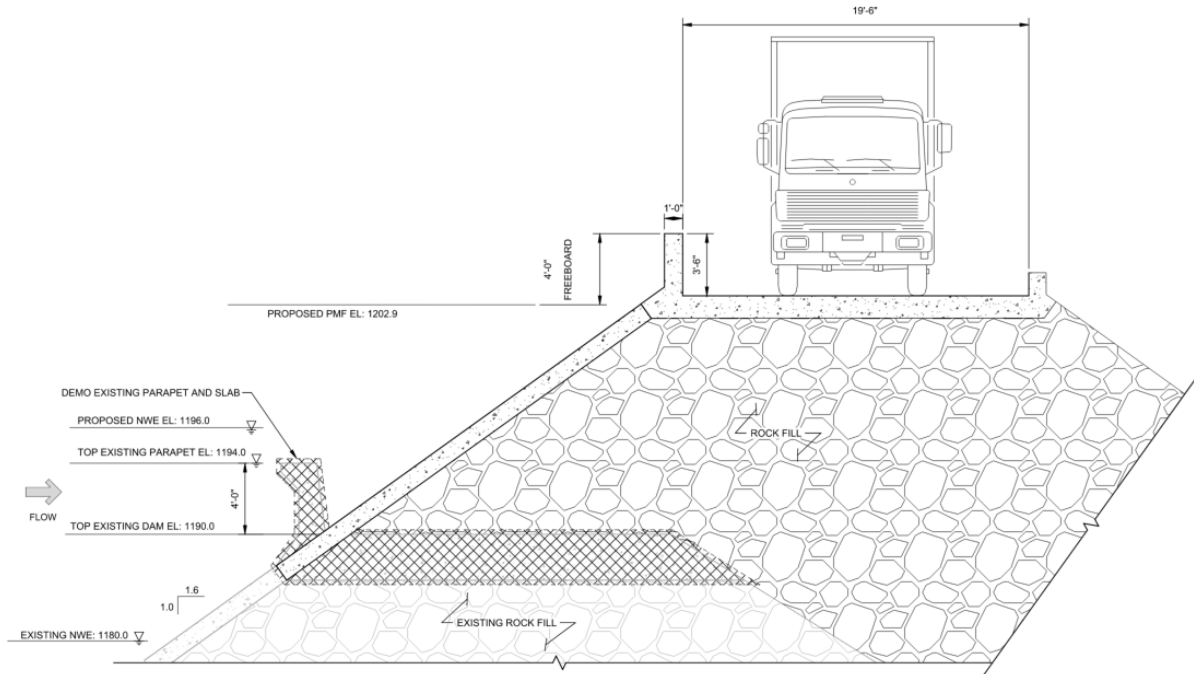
Schematic of proposed dam embankment for Bradley Lake Pool Raise.
